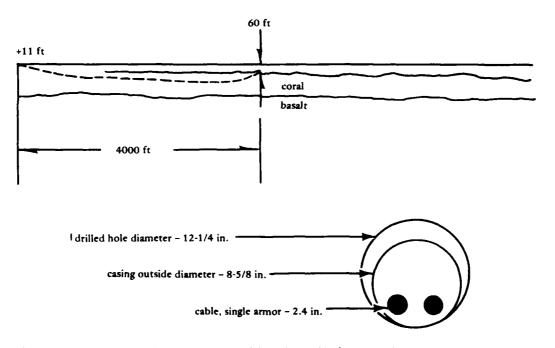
Horizontal pipeline boring rig drill-hole profile for 4,000-ft traverse. Cross section shows drill-hole, casing, and cable relationship (Valent and Brackett, 1977).
